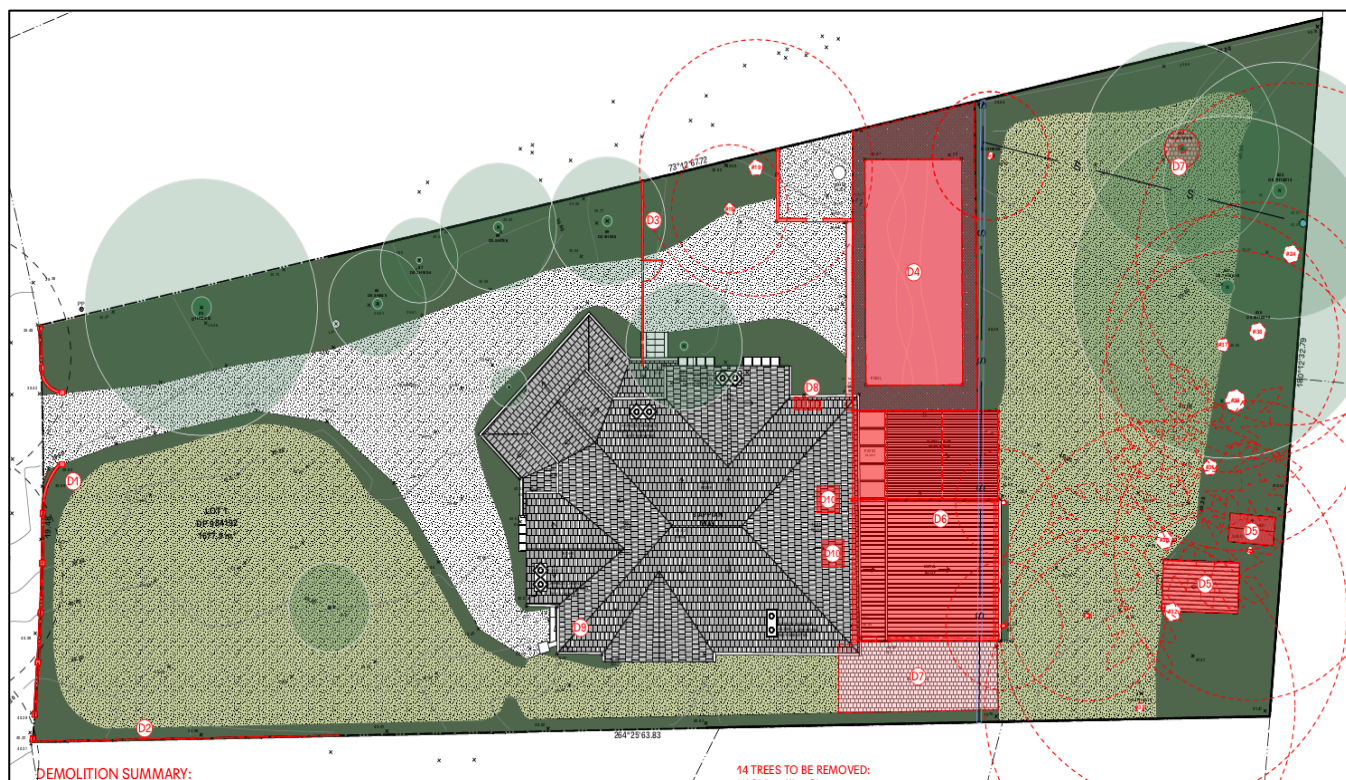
Extract of the applicant's submitted Demolition Site Plan.
